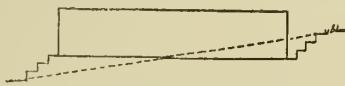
HOUSE HALF EXCAVATED, HALF EMBANKED.
